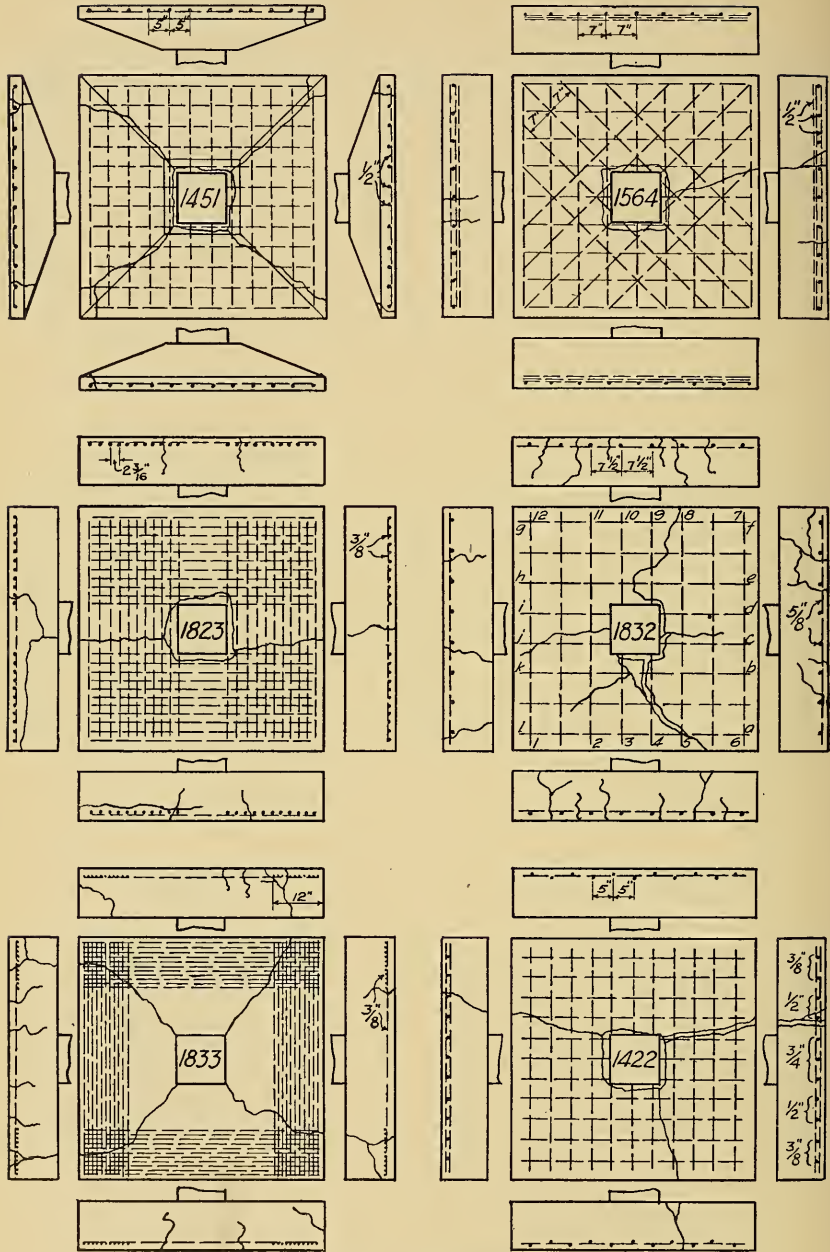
REINFORCED CONCRETE COLUMN FOOTINGS.
